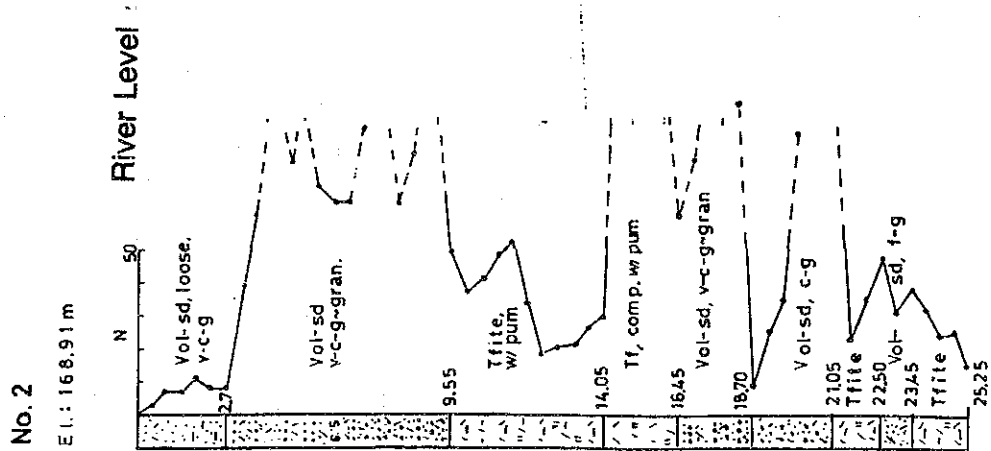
Soil Profile at the Bridge Site in La Illusion, Nandaime (1)
